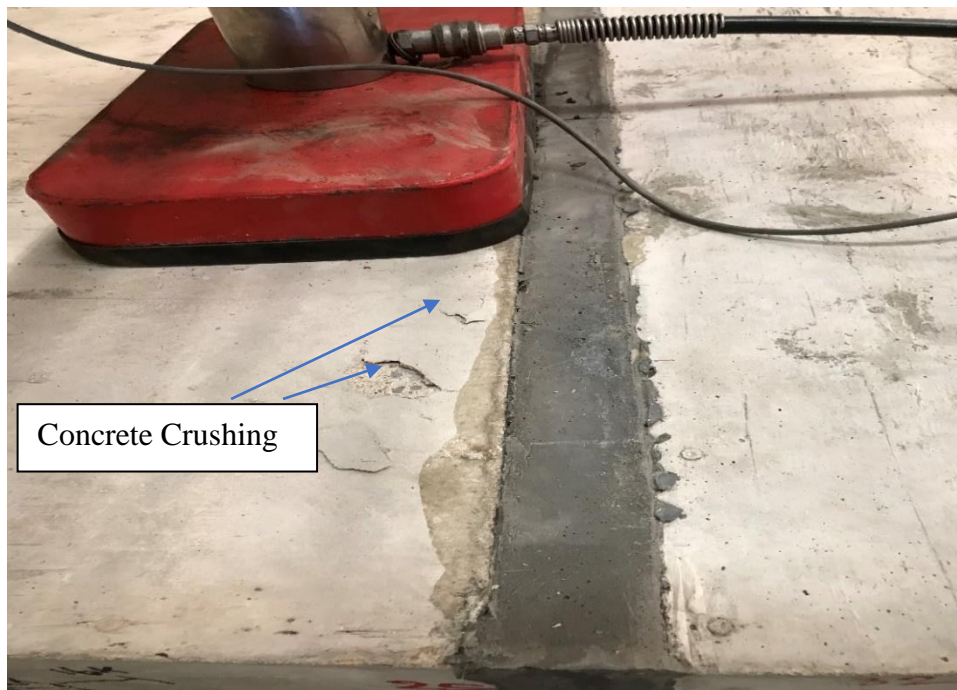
Concrete crushing at the top of the slab for J3 slab 2 at failure
